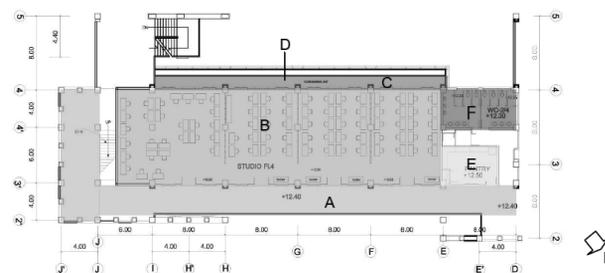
Plan of Interior Architecture Studio AR-412-1/AR-412-2 (Floor 4) A. Public and Circulation Area, B. Working Area, C. Terrace, E. Pantry, F. Toilet
